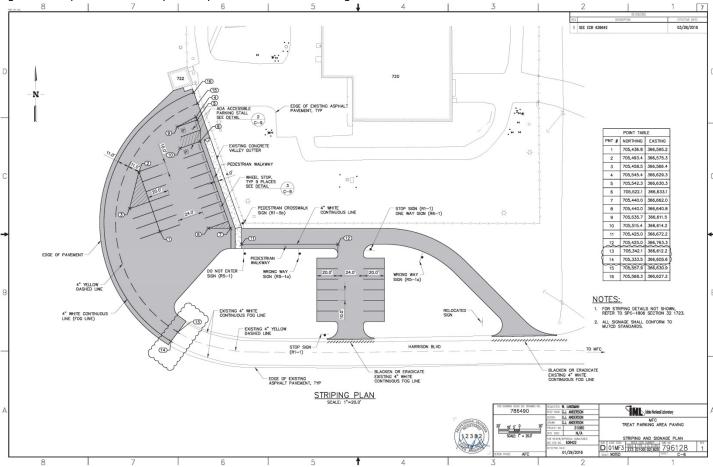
Proposed Area of Asphalt Replacement, Overfill Parking, and Access Road.
